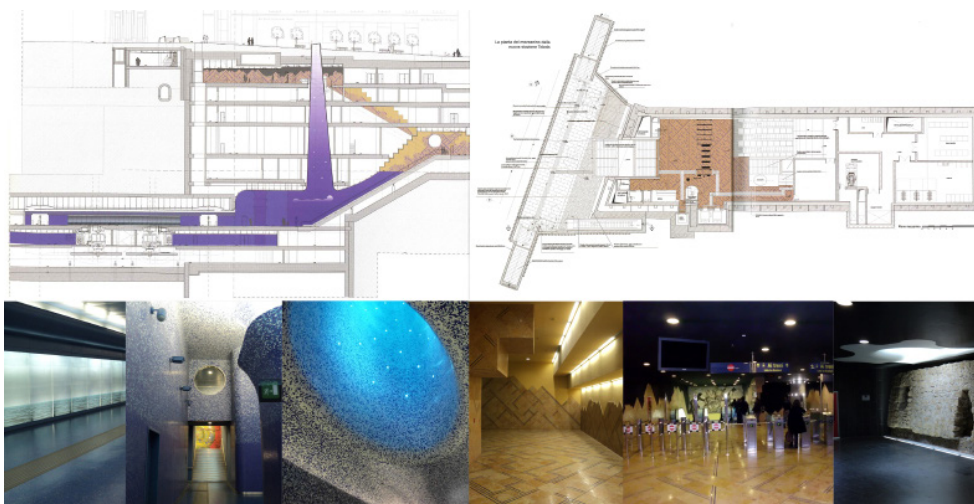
Toledo Station. Above: section on the “light crater” and mezzanine floor. Below: views of some of the interiors of the station where you can see claddings in with blue and white mosaic tiles, ochre tiles and anthracite gray lava stone. (Drawings from Tusquets Blanca, 2011, p. 6-9. Photos by authors).
